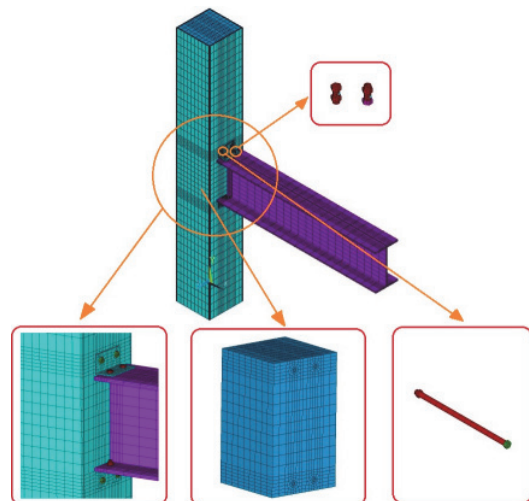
Typical finite element model of CFT column-to-beam connection with a top-seat angle
